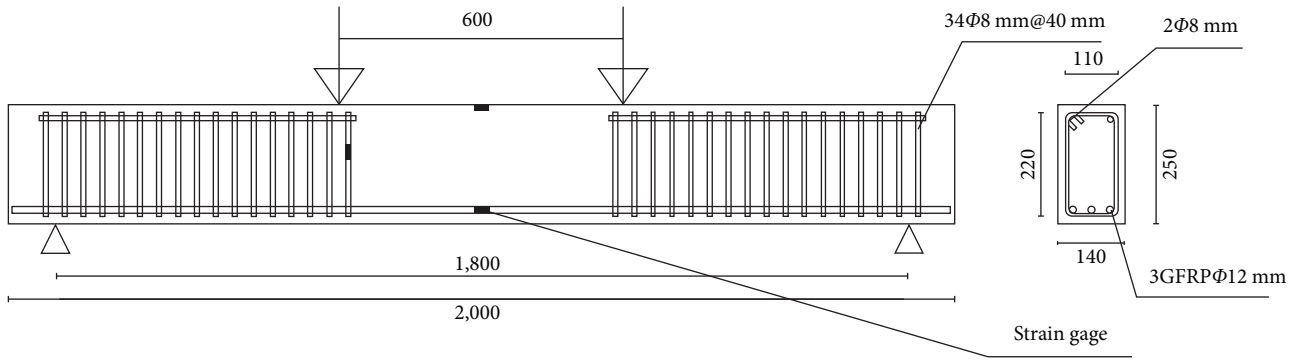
Reinforcement details of beam specimens (all dimensions in mm).
